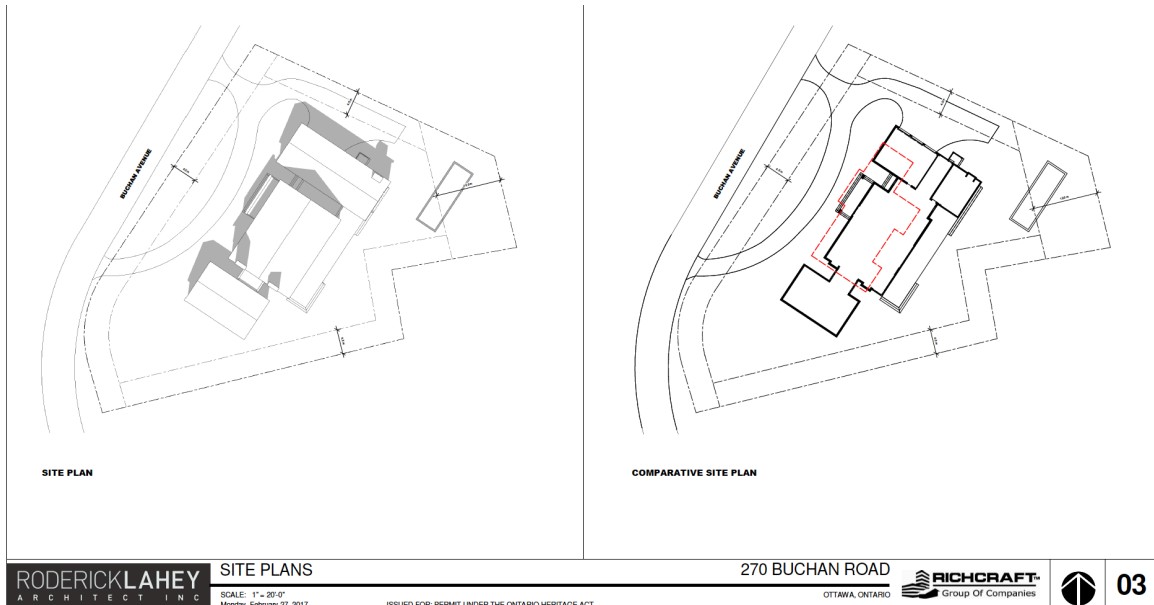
Comparative Site Plan with the existing building's ground floor plan shown by a red line (source: Roderick Lahey Architect Inc.)
